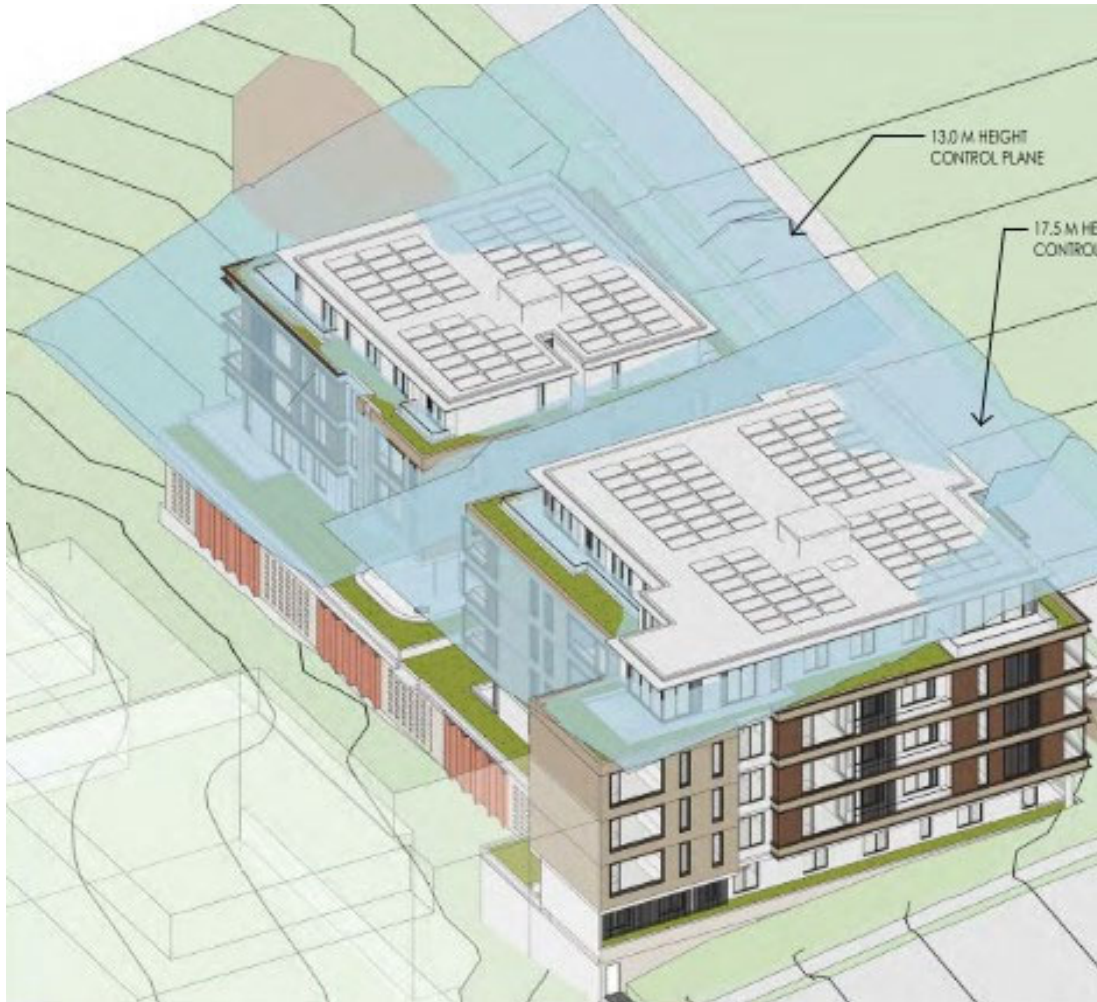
Applicant's illustration of the proposed building height breach as measured from existing ground levels
